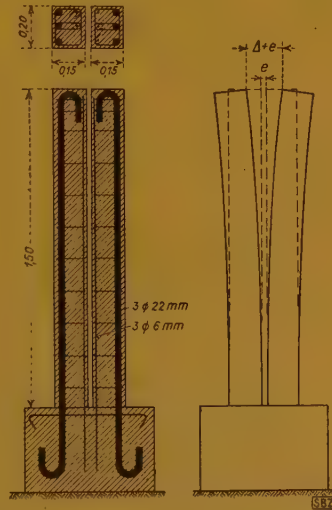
Test prisms placed back to back, dissymmetrically reinforced, before and after expansion of the concrete.
